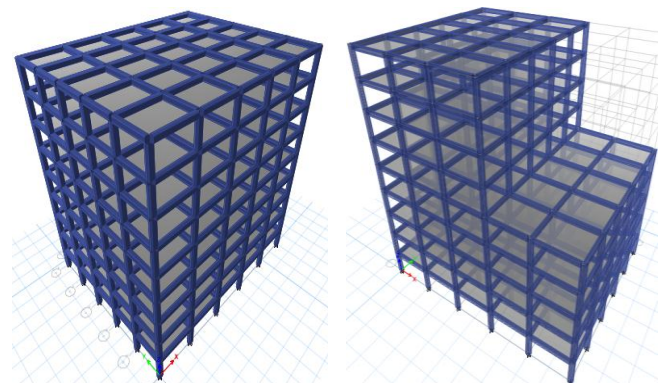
3d plan of bare frames of model1 and model2 respectively.
